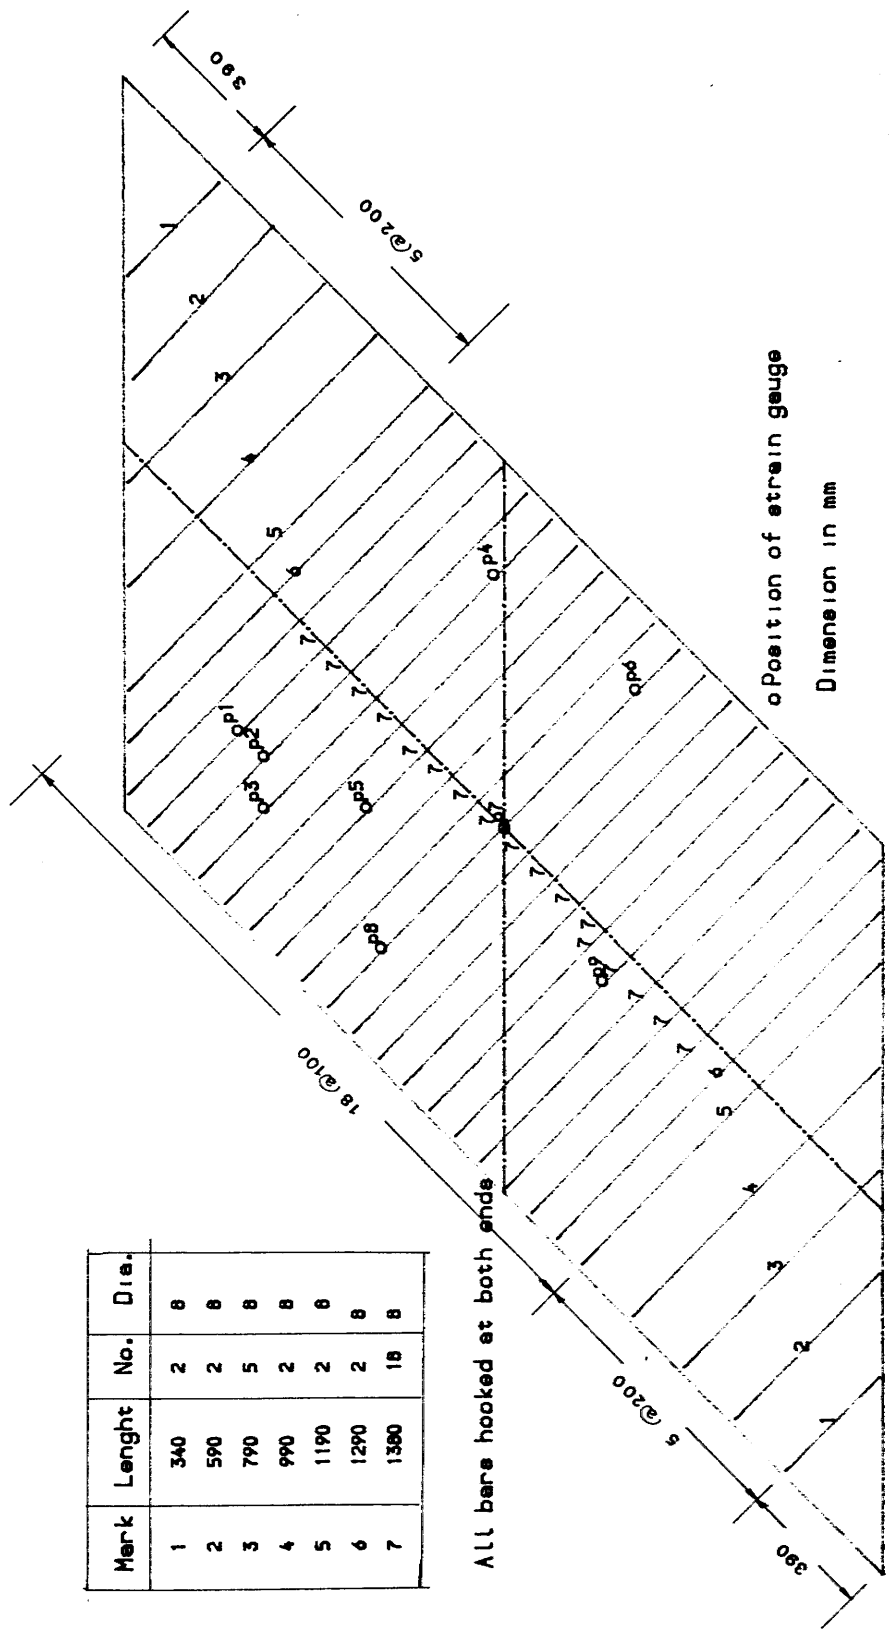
MODEL SKEW SLAB NO. (5) Details of bottom transverse steel orthogonal to the free edge and position of strain gauges.
